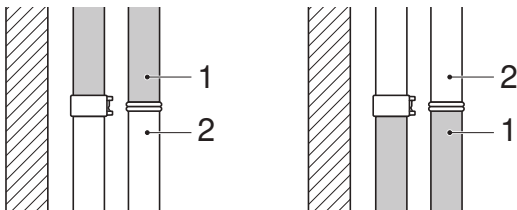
Adapter with Geberit electrofusion coupling or butt welding
